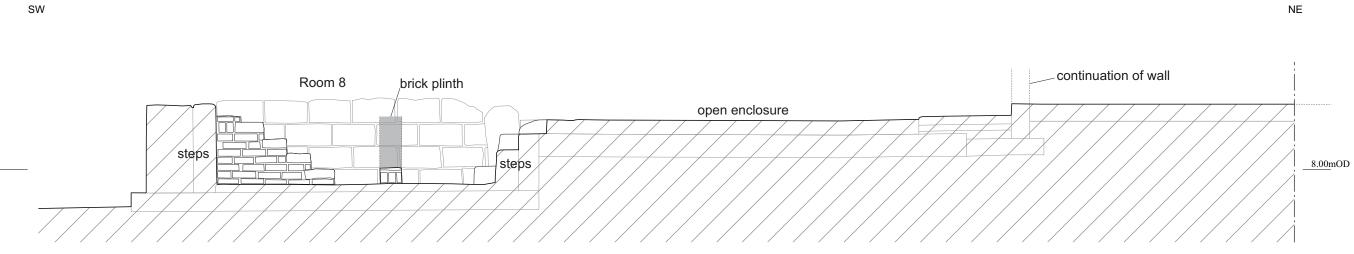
South-east facing cross section (S3) of command post, Building 17, showing room B
